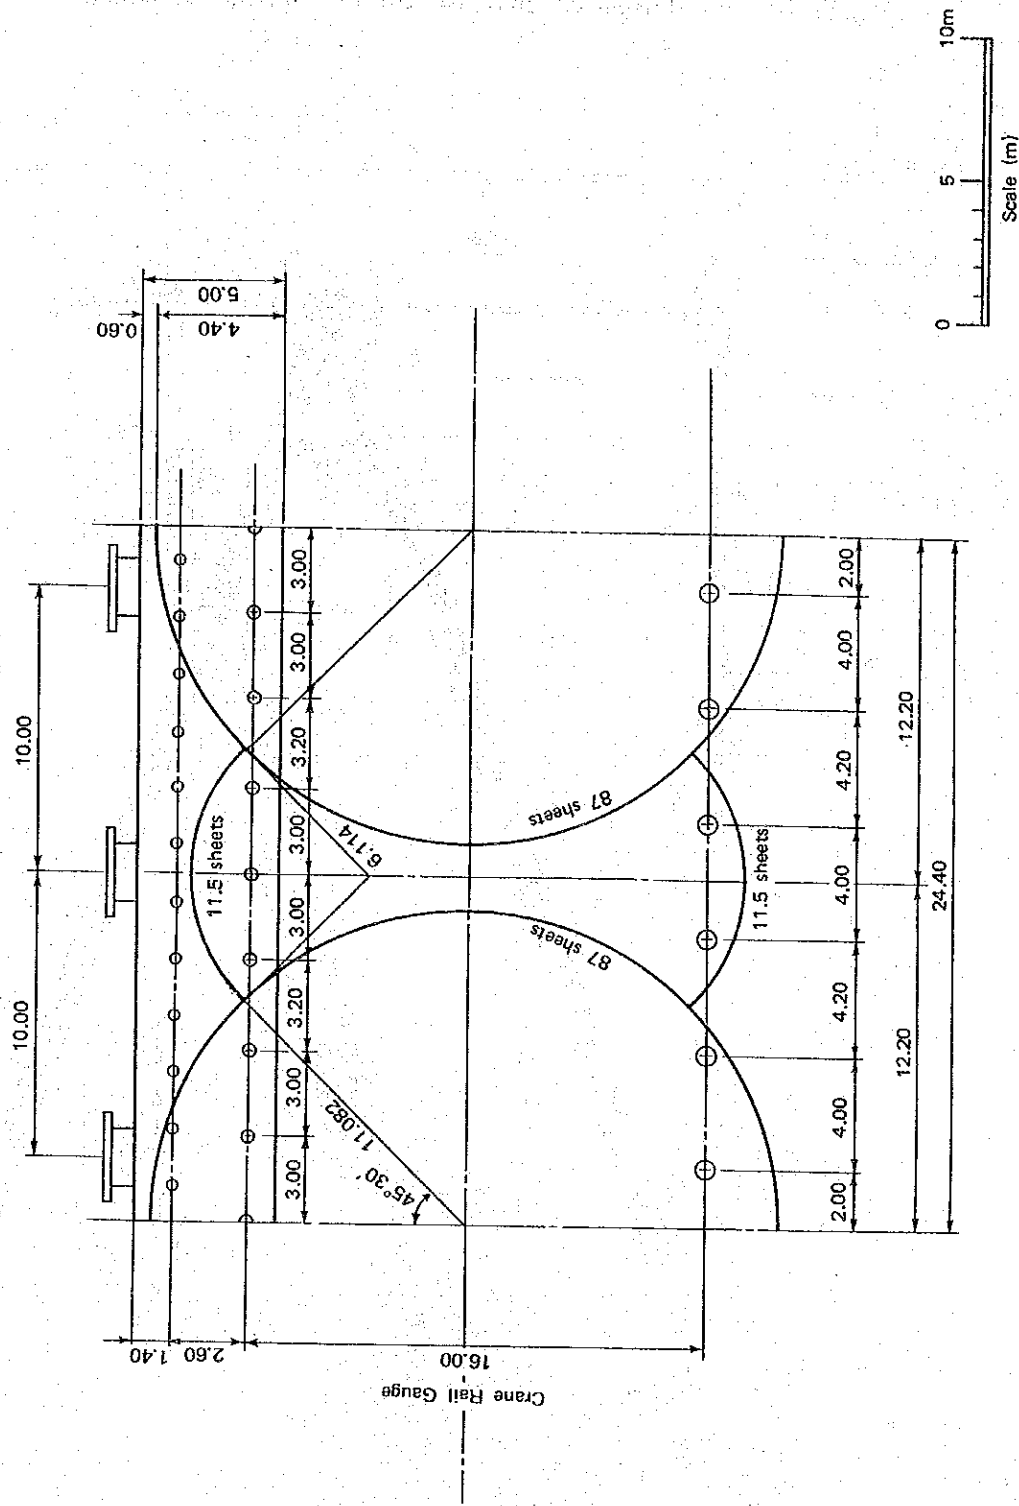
Steel Sheet Pile Bulkhead for the Container Terminal (Oasim Port)
